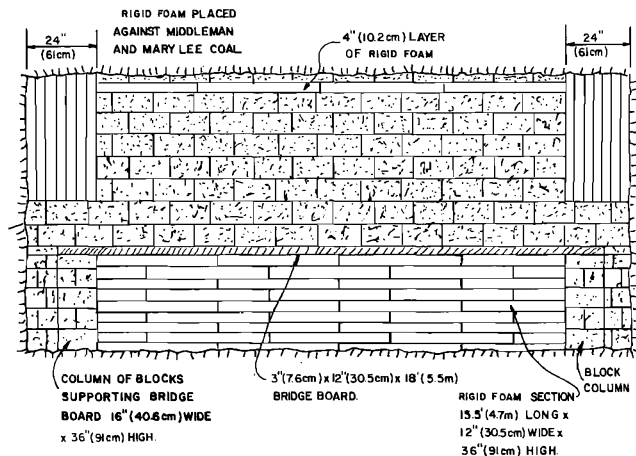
Design of foam board and concrete block stopping for rib convergence-floor heave conditions
